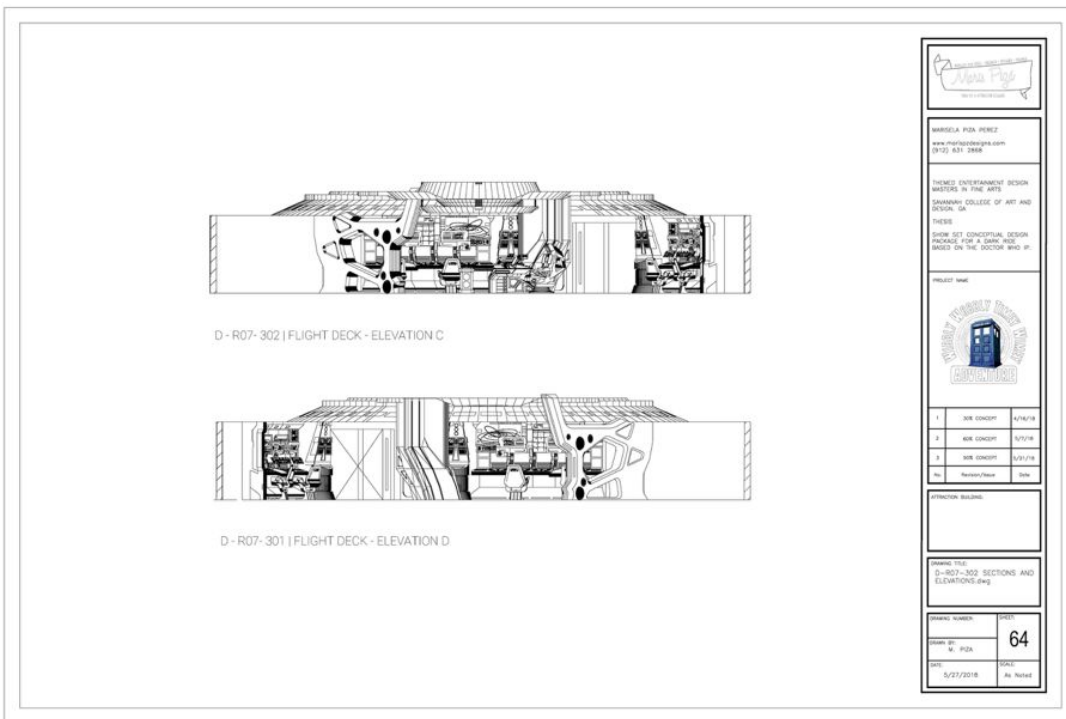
D-R07-302 | Flight Deck - Sections and Elevations
